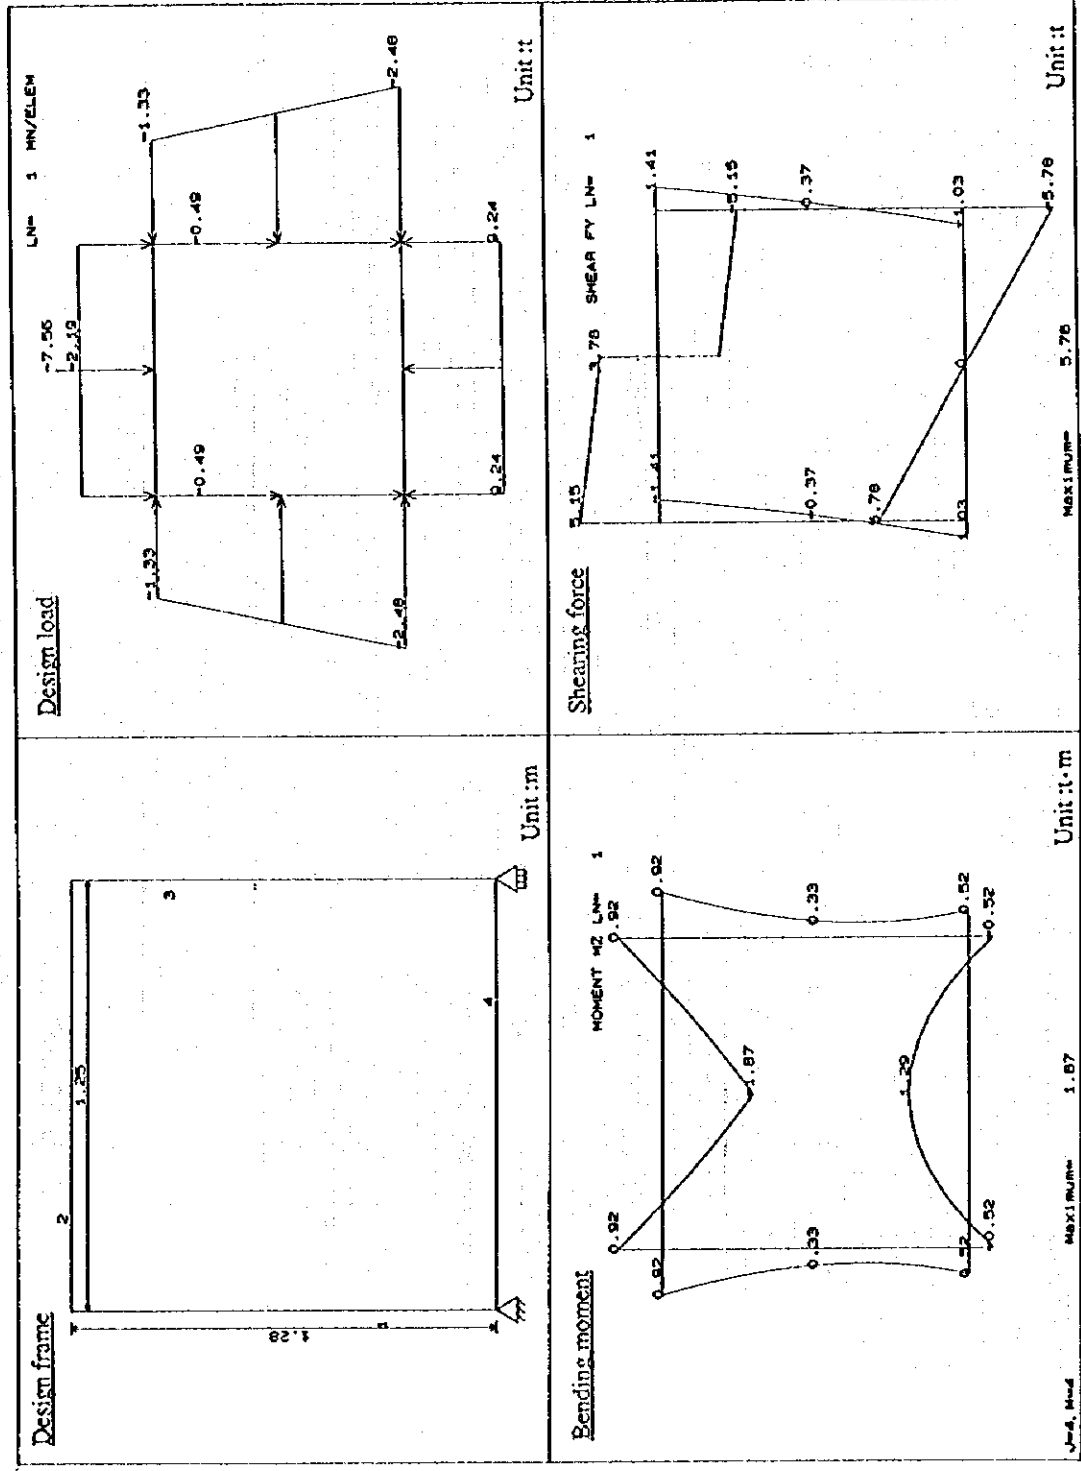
Stress Analysis on Transverse Section of Sluiceway Conduit (1/12)
